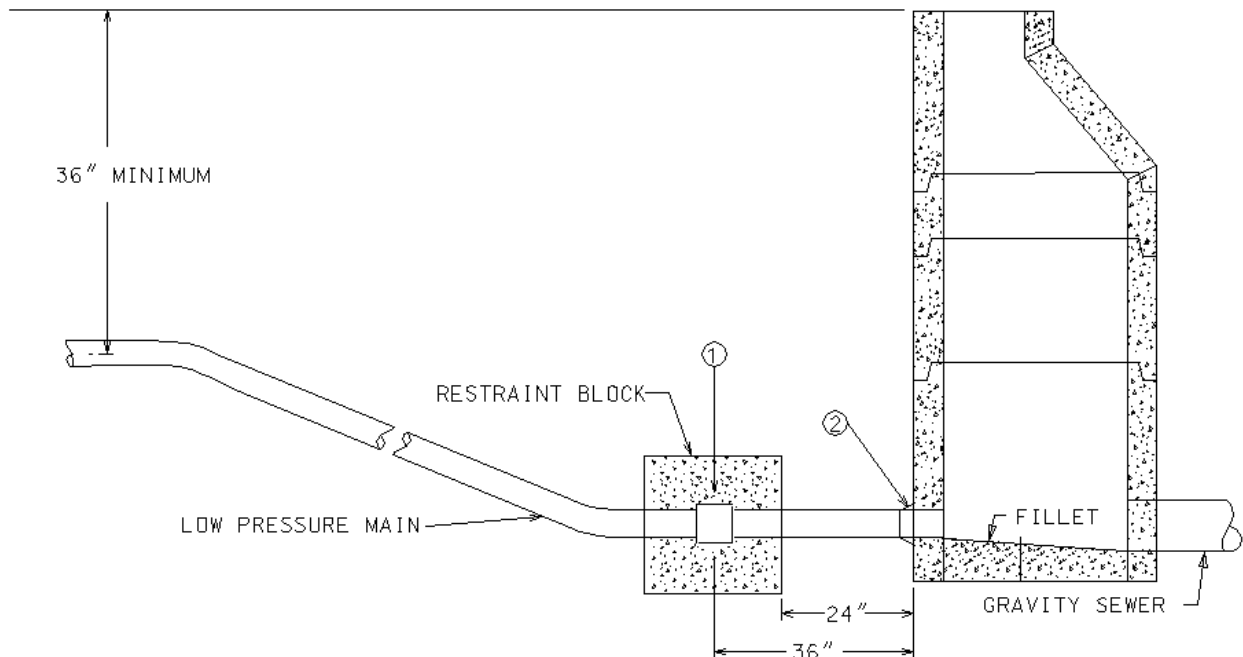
f (Standard Detail for Connection of Low Pressure Sewer Mains to Gravity Sewer Manholes)
